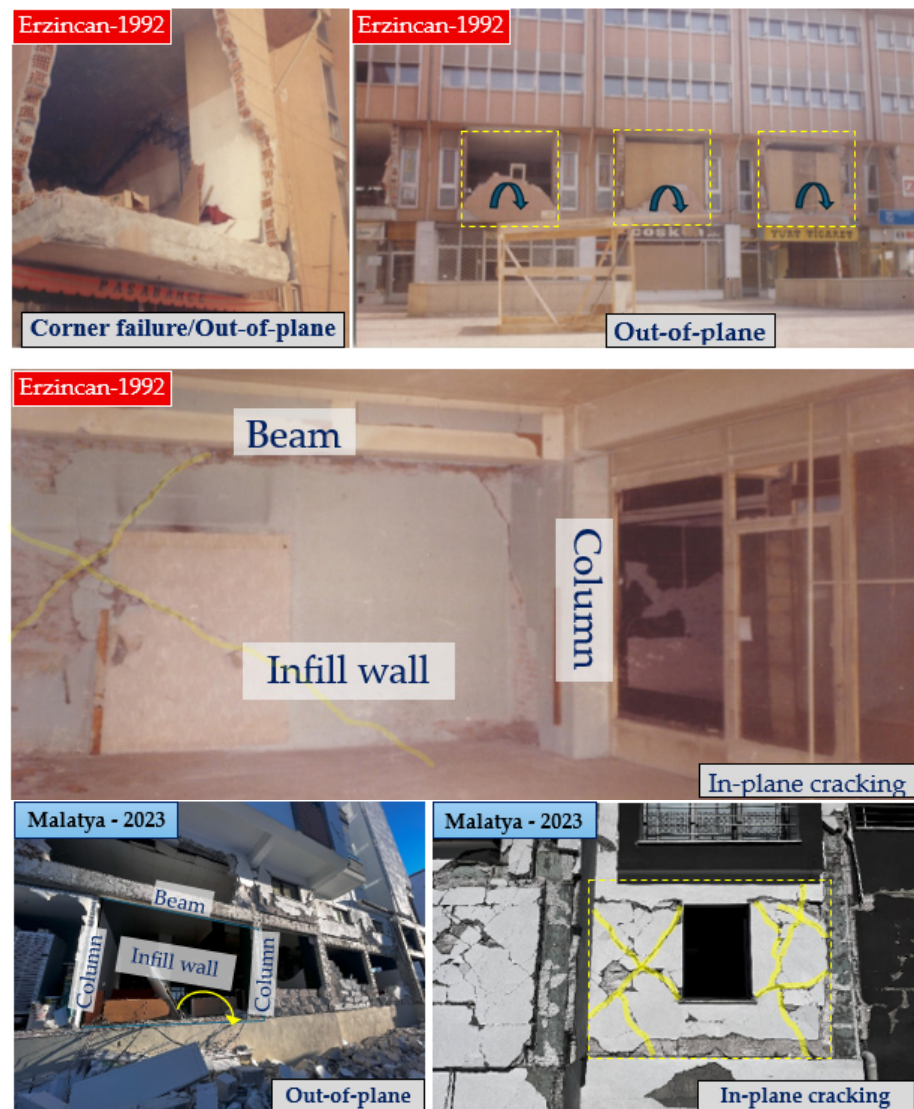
In-plane cracking, corner failure, and out-of-plane collapse mechanisms observed in infill walls of reinforced concrete buildings following the Erzincan (1992) and Malatya (2023) earthquakes.
